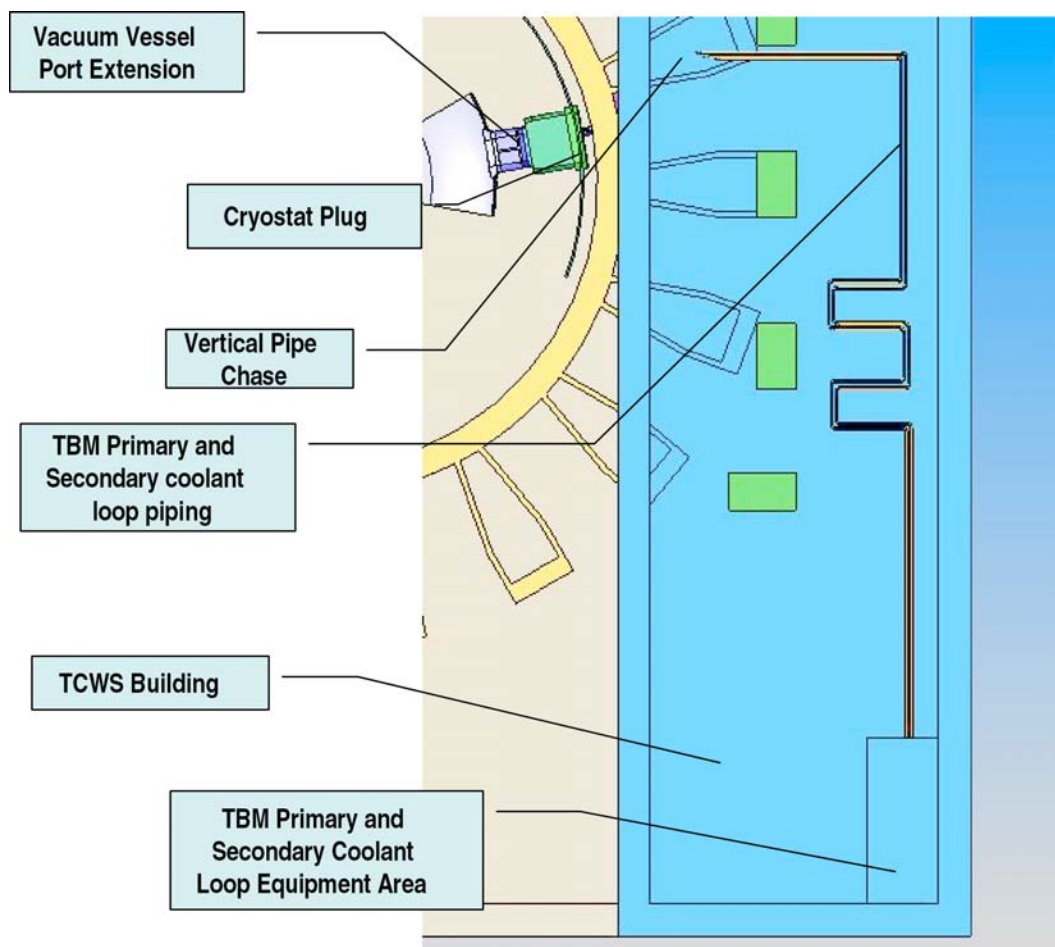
Piping from TBM to TCWS building.
